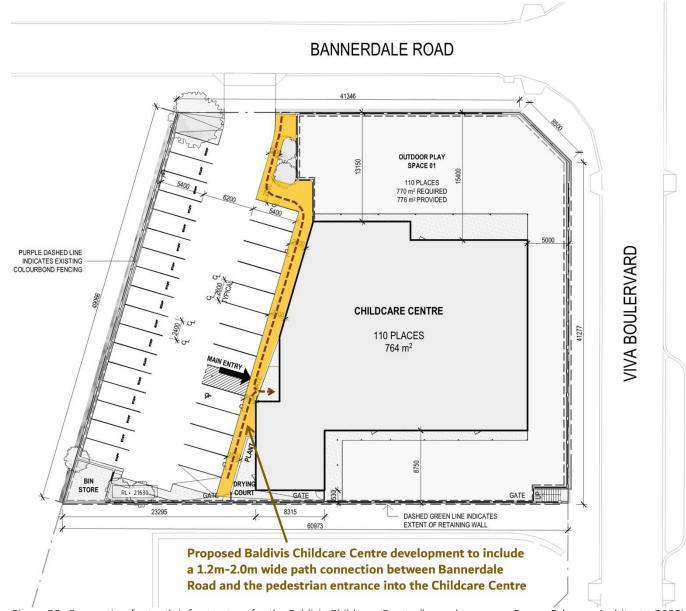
Connecting footpath infrastructure for the Baldivis Childcare Centre (base plan source: Brown Falconer Architects, 2022)
